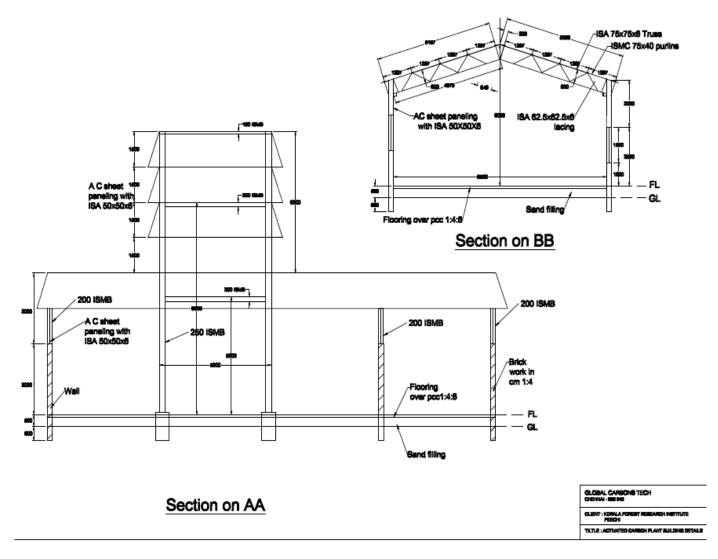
Sectional Elevation of Carbonizing Plant
